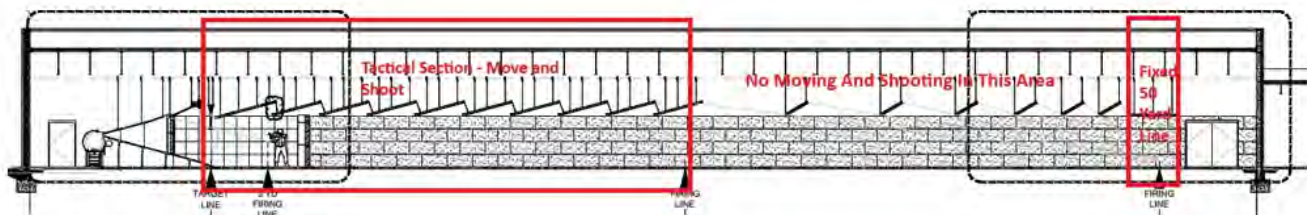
Hybrid Tactical Ceiling Baffle Layout
